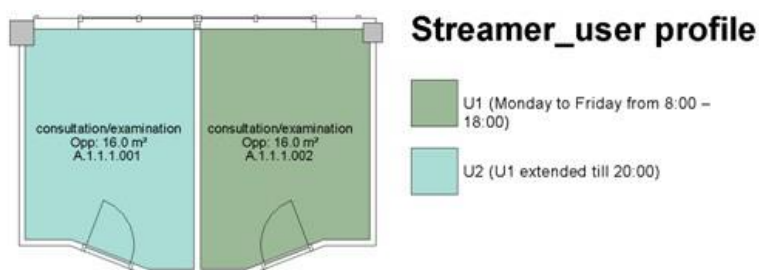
Visualisation of room properties in a floor plan (Rijnstate extension)
